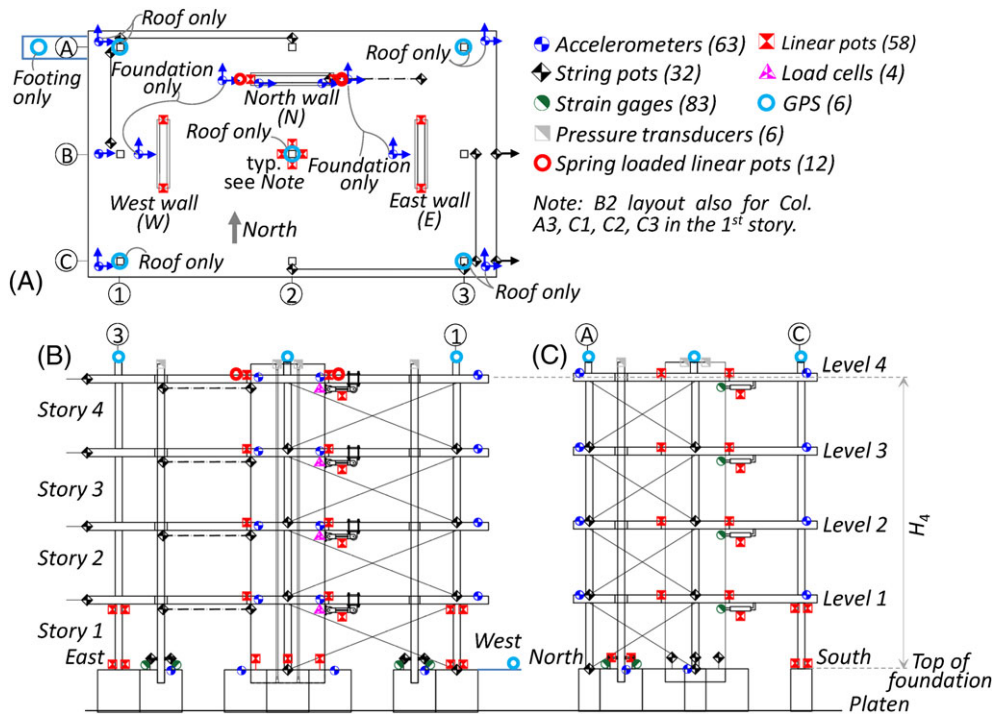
Typical instrumentation view: A, plan; elevations: B, north; C, west [Colour figure can be viewed at wileyonlinelibrary.com]
